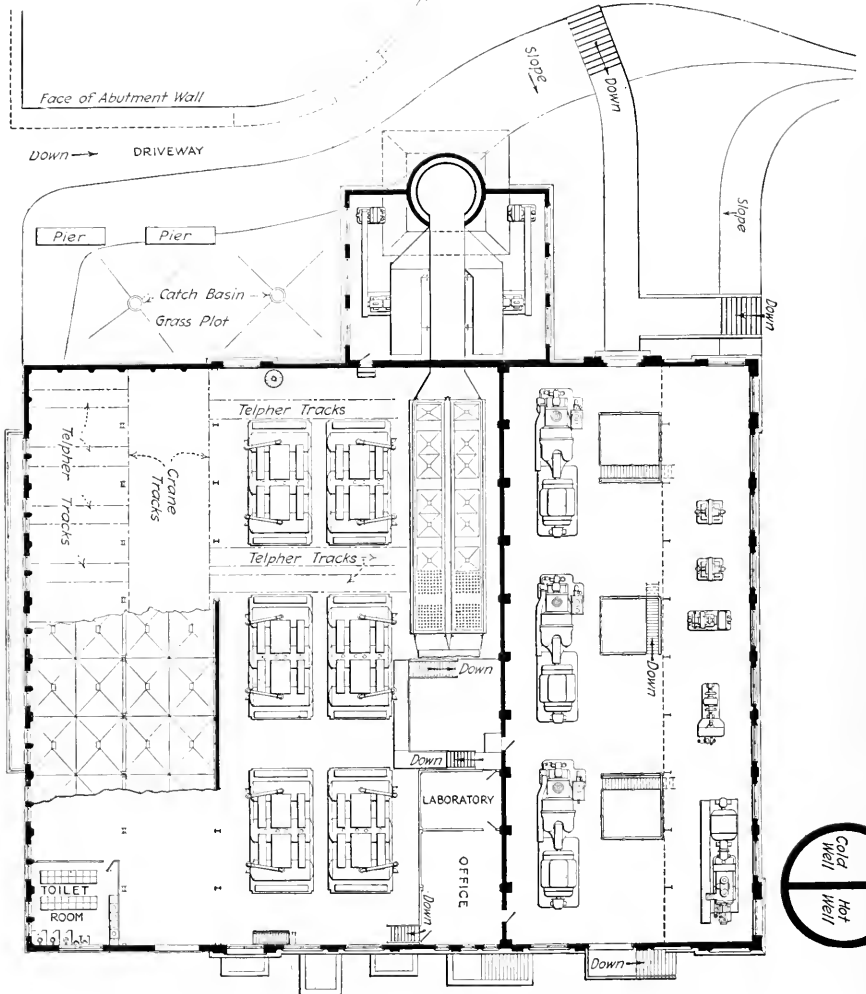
FLOOR PLAN OF THE CLEVELAND MUNICIPAL LIGHTING PLANT
